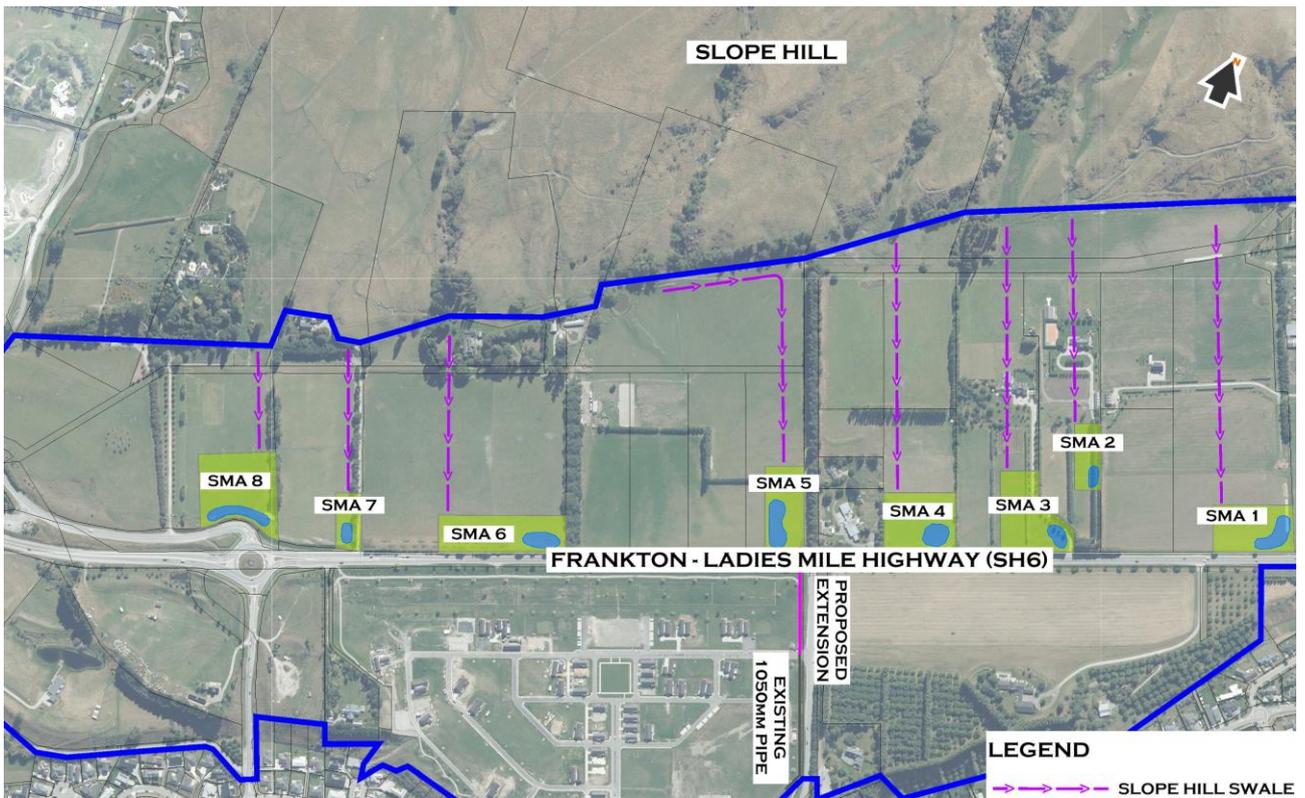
Individual landowner stormwater management area conceptual layout plan for North 2.
